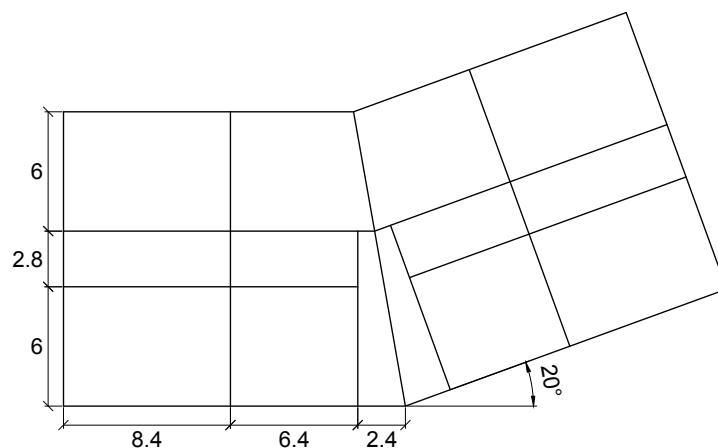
Floor plan layout used to define the Puukuokka volume
